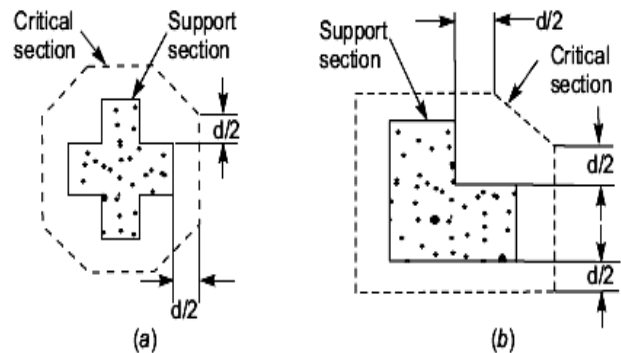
Critical Section for Columns Sections with Re-Entrant Angles
